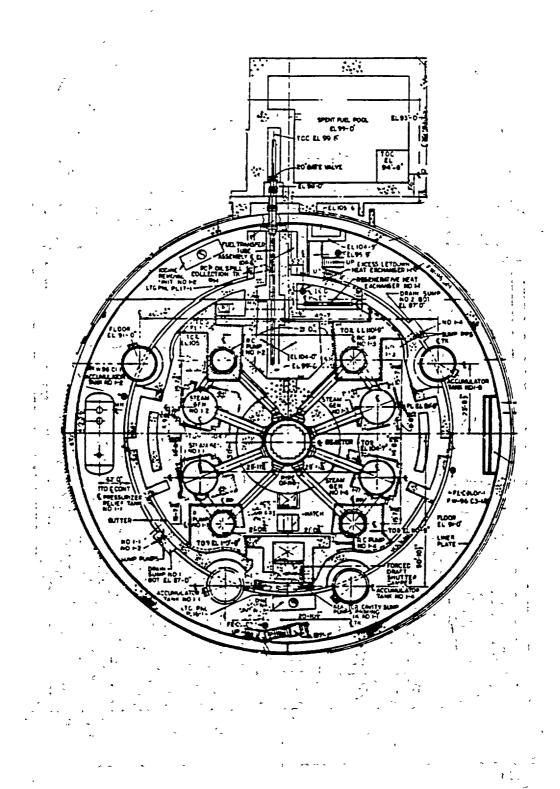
Plan View of the Diablo Canyon Large, Dry Containment (Reinforced Concrete)
